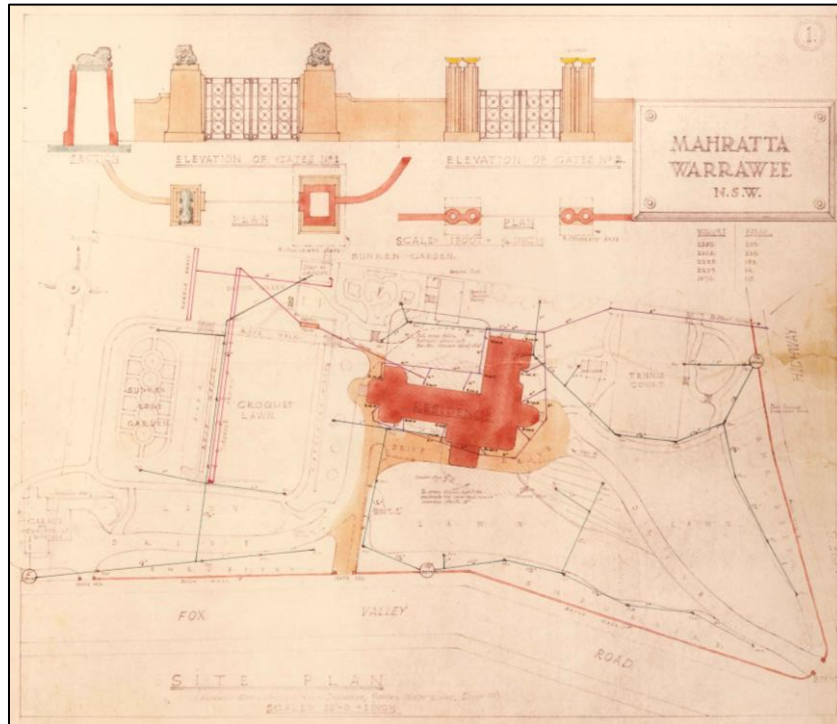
Douglas Agnew’s plan of the Mahratta site (Source: Schwager Brooks Heritage Analysis 1989)
